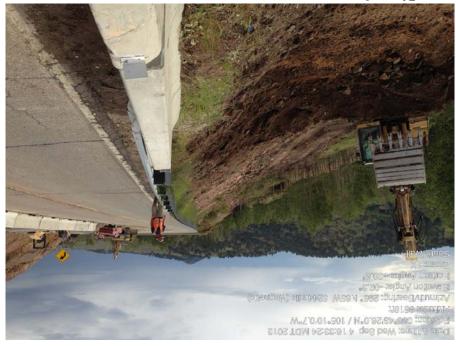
Clearing and Grubbing – HWY 67, Prep for Sliver Fill Placement.
